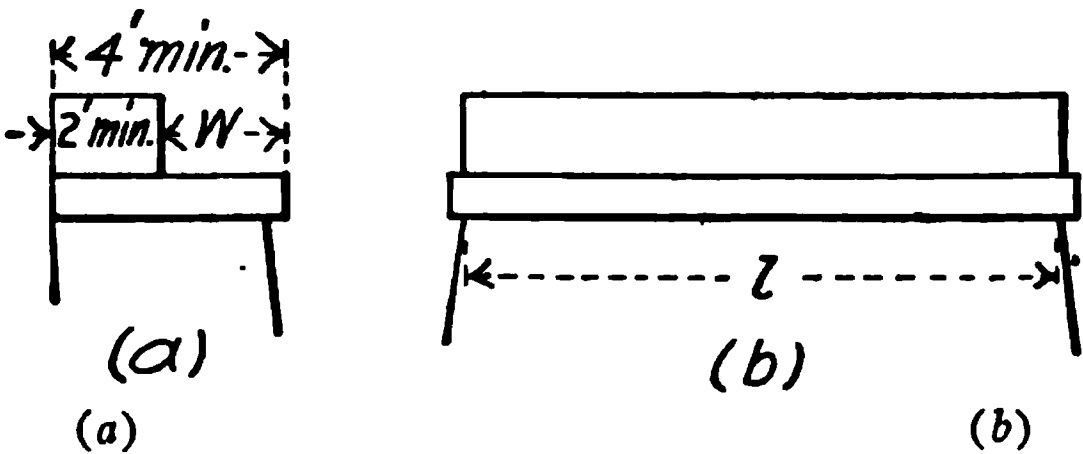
MASONRY ABUTMENTS FOR ELECTRIC RAILWAY BRIDGES, SCHNEIDER'S STANDARDS.
